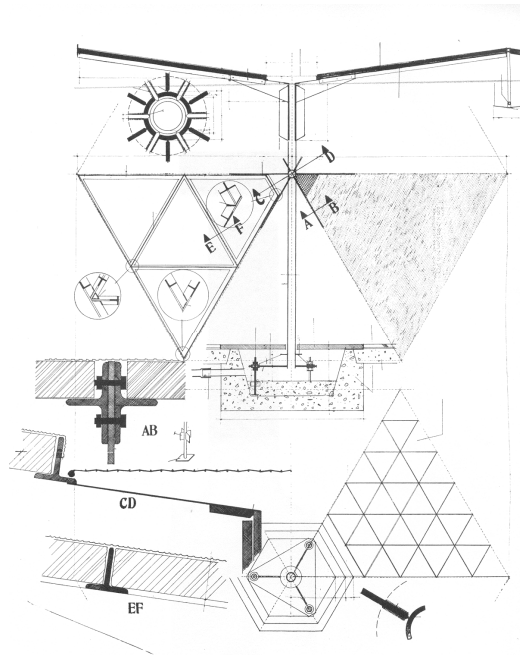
Brussels Pavilion, 1958. Detail of hexagonal module.
